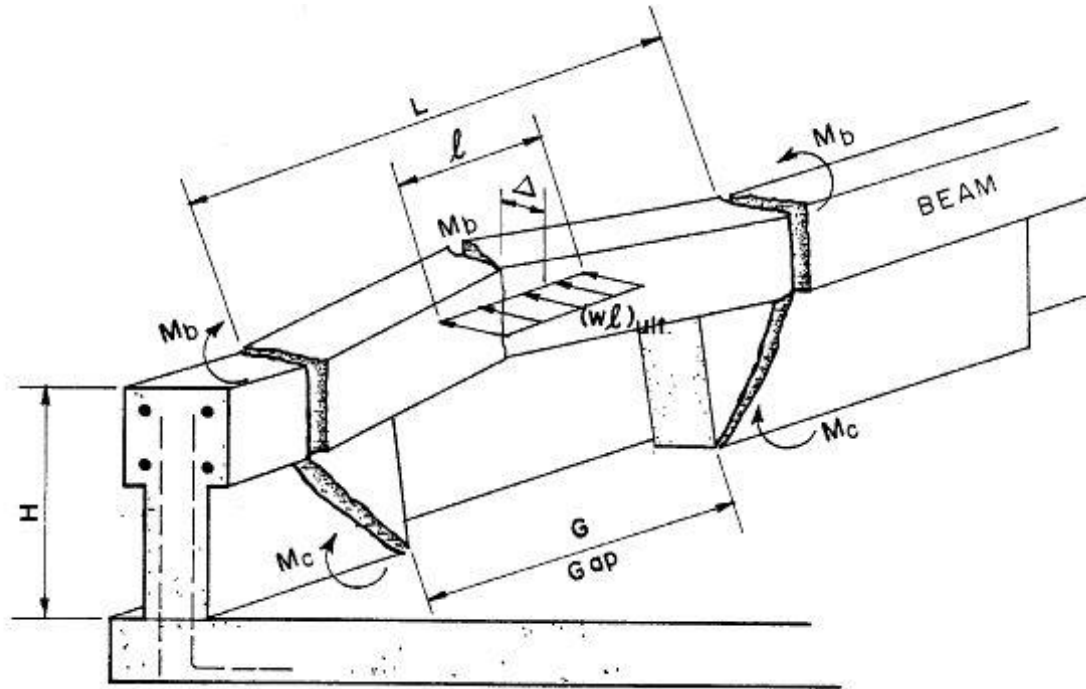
Yield Line of a Concrete Post and Beam System [26]
